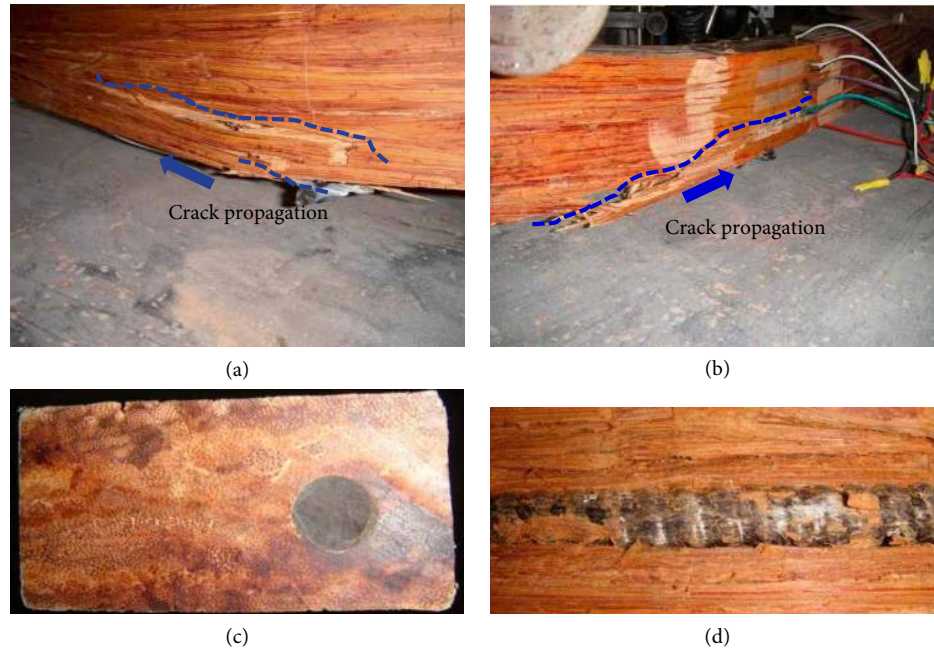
Failure photos: (a) failure position of specimen A0, (b) failure position of specimen A1, (c) end of specimen A1, and (d) the BFRP bar in the middle of the laminated bamboo beam.
